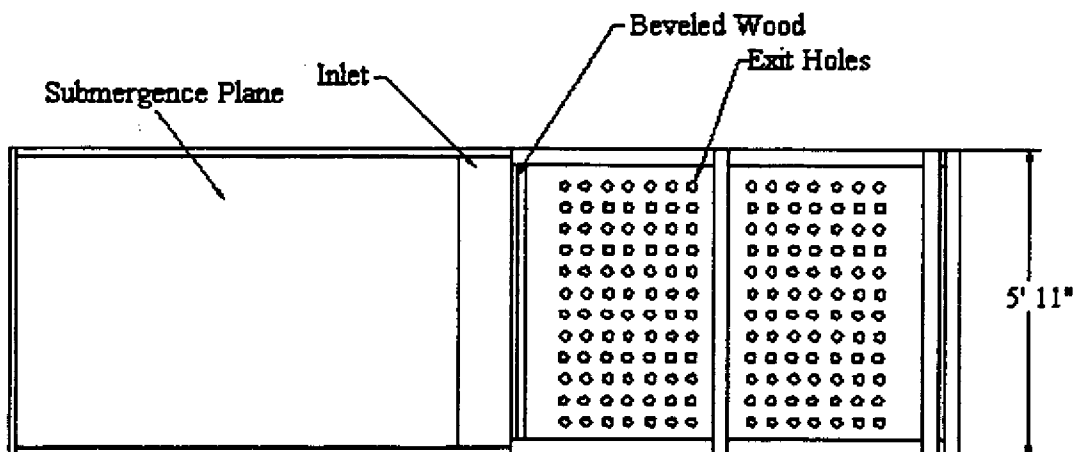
Schematic bottom view of Prototype. Major components are labeled.
